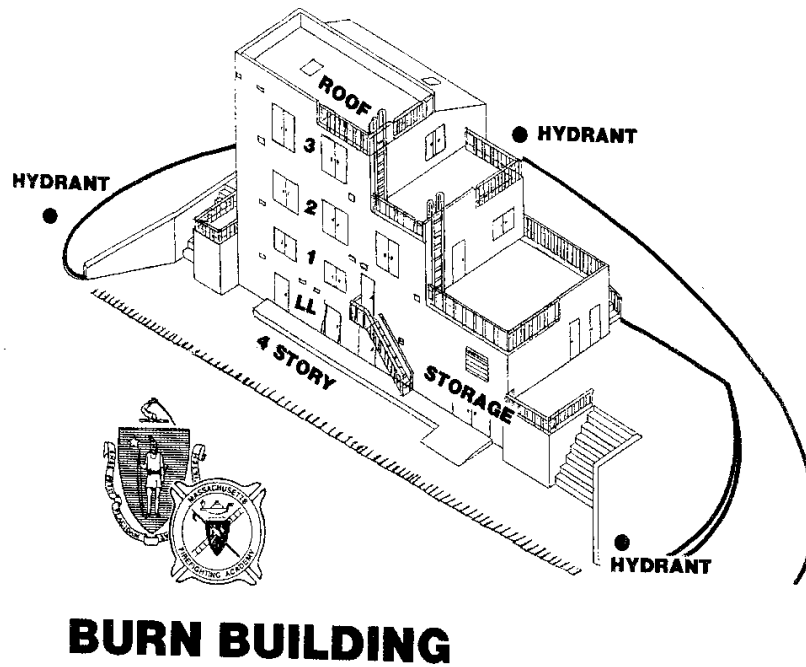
Sketch of Stow Burn Building, Courtesy of Massachusetts Firefighting Academy
